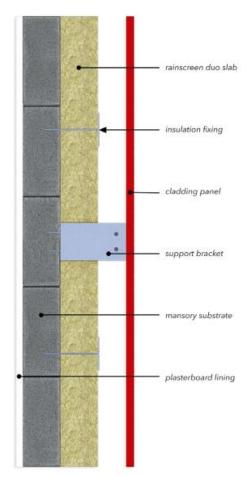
Diagram of stone wool insulation between cladding system and concrete/masonry
